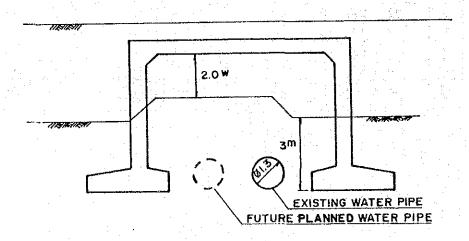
RC Portal Frame Culvert for Water Main Protection
